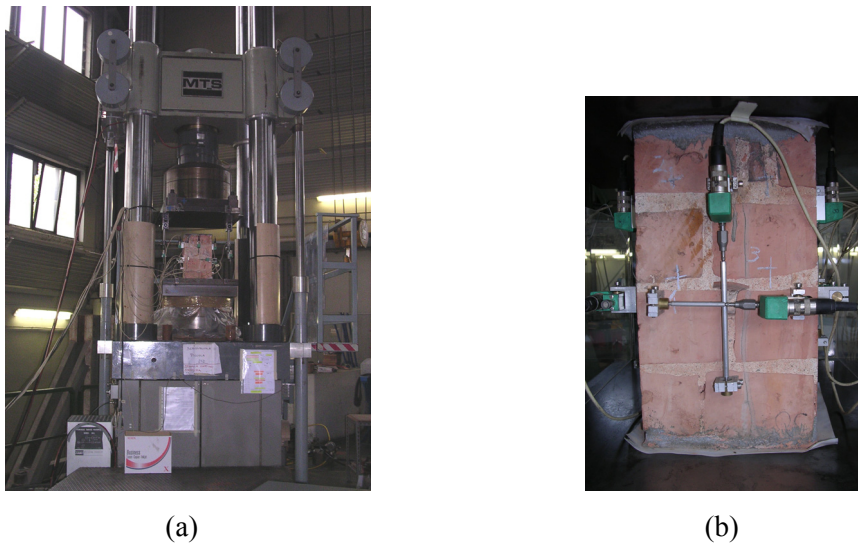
Test setup: (a) MTS[®] testing machine and (b) instrumented (*PRe*) specimen.
